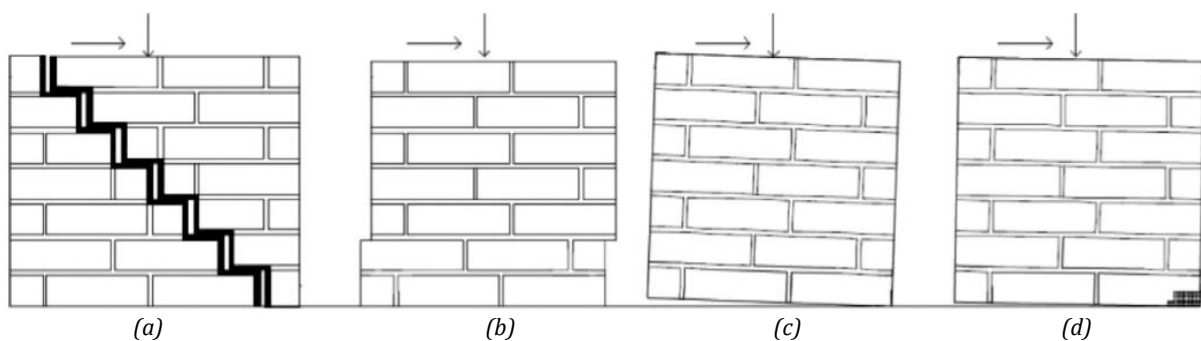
In-plane failure modes of URM walls: (a) diagonal cracking; (b) bed-joint sliding; (c) rocking; (d) crushing (Khan et al., 2017)
